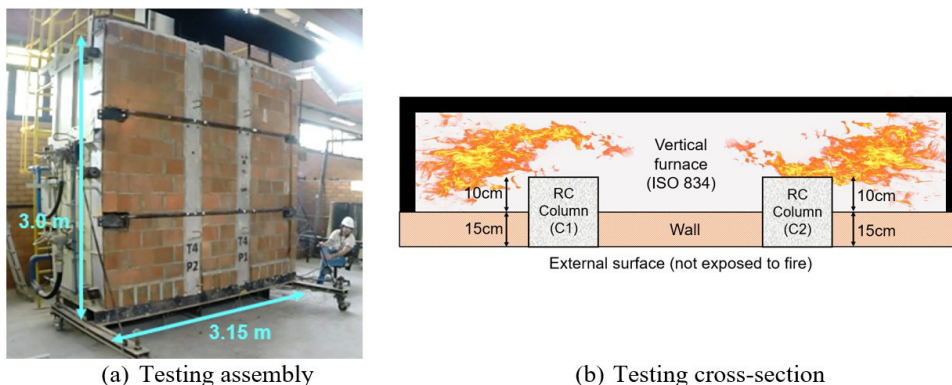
The vertical system (columns + walls) placed in the vertical furnace.
